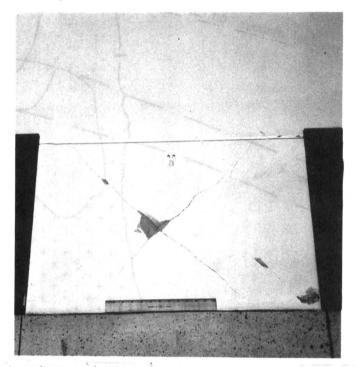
/45 : Typical example of X-cracking in brick panel within beam and column trame ; Kazerne Goods, Office, Johannesburg
